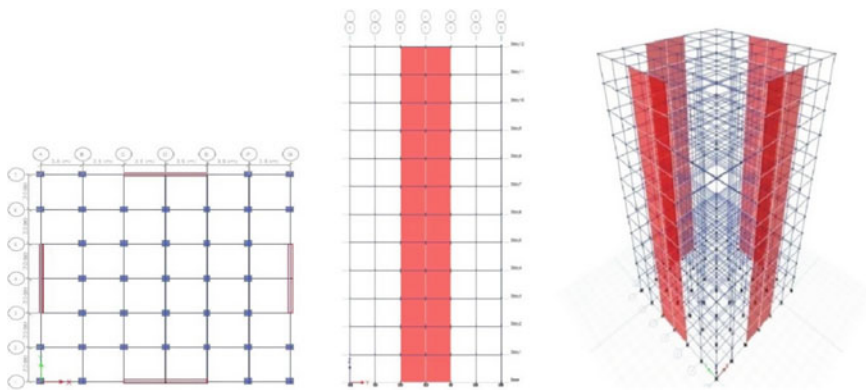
Plan, elevation, and 3D model of 12-storey building with dual-wall
